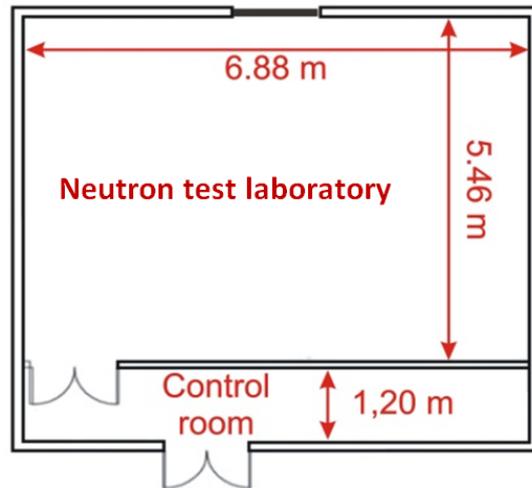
Simplified floor plan of the Neutron Test Laboratory.
